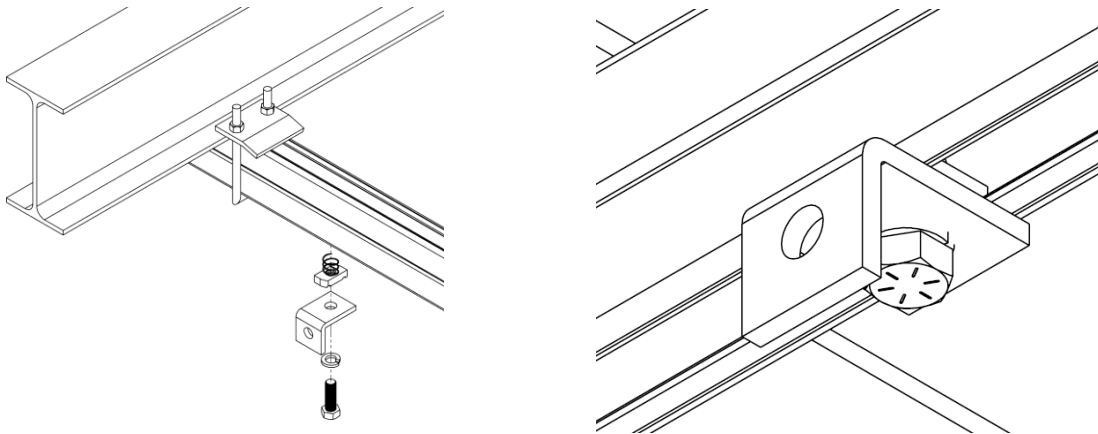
Two-Hole Strut Fitting, Facing Downwards
